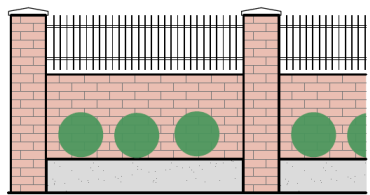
Semi-permeable fencing – brick pier and wall to 1200mm with integrated planter. Permeable infill panel above 1200mm
